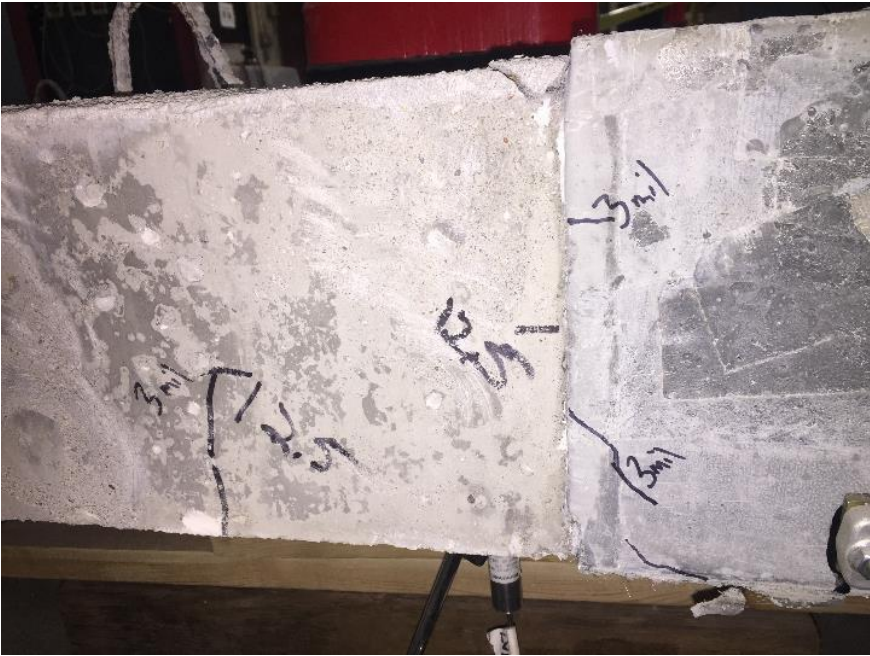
Side view of marked cracks on slab after fatigue loading
